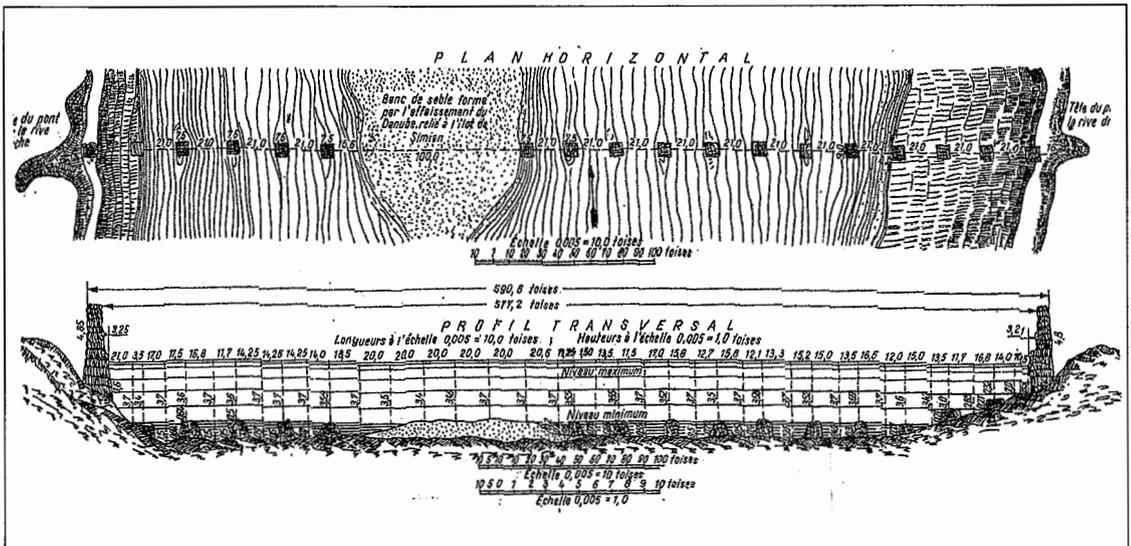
Popovici's plan and profile from 1858 (profile on 10 horizontal to 1 vertical).
